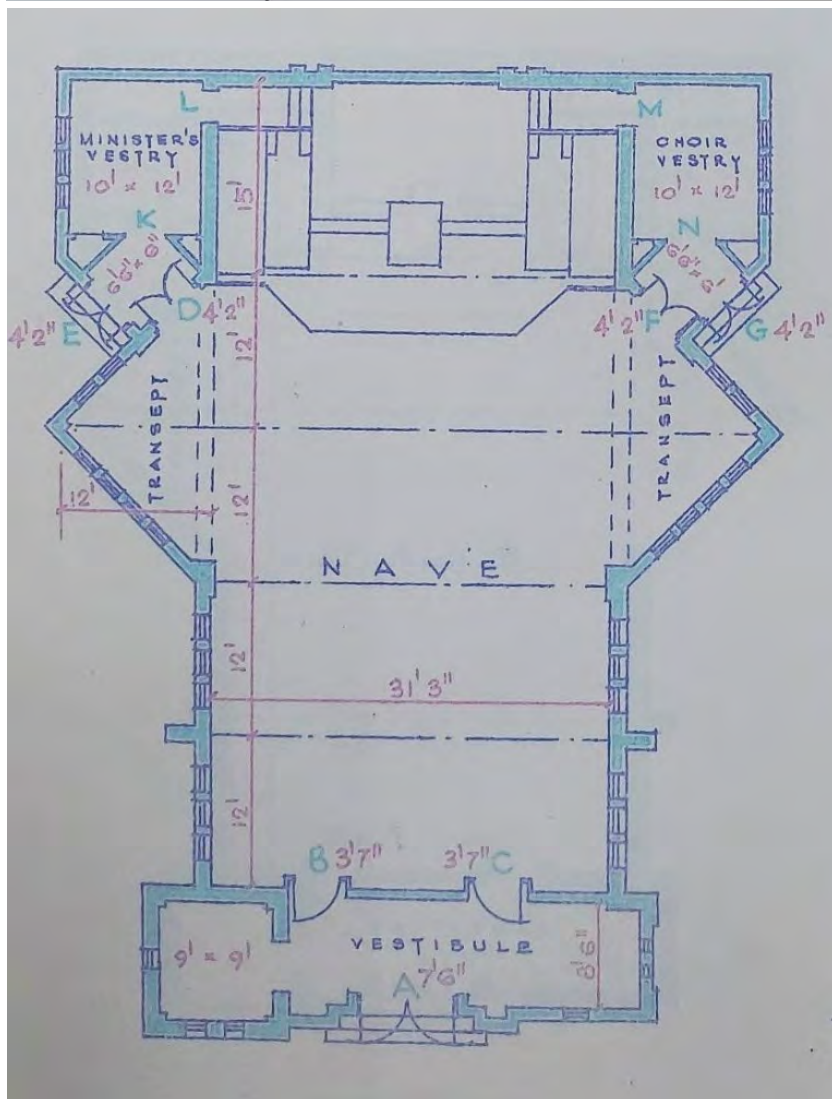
Plan of St Giles' church, June 1971 (Source: PROV, PB File)
